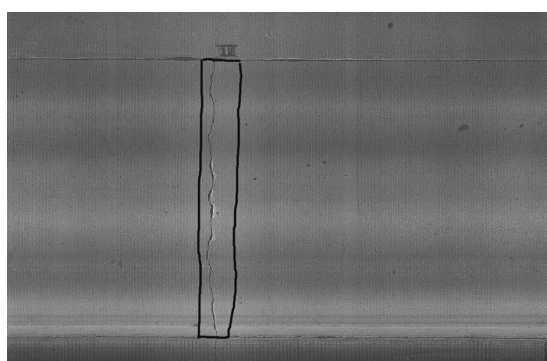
An example of transverse crack on concrete pavement surface
